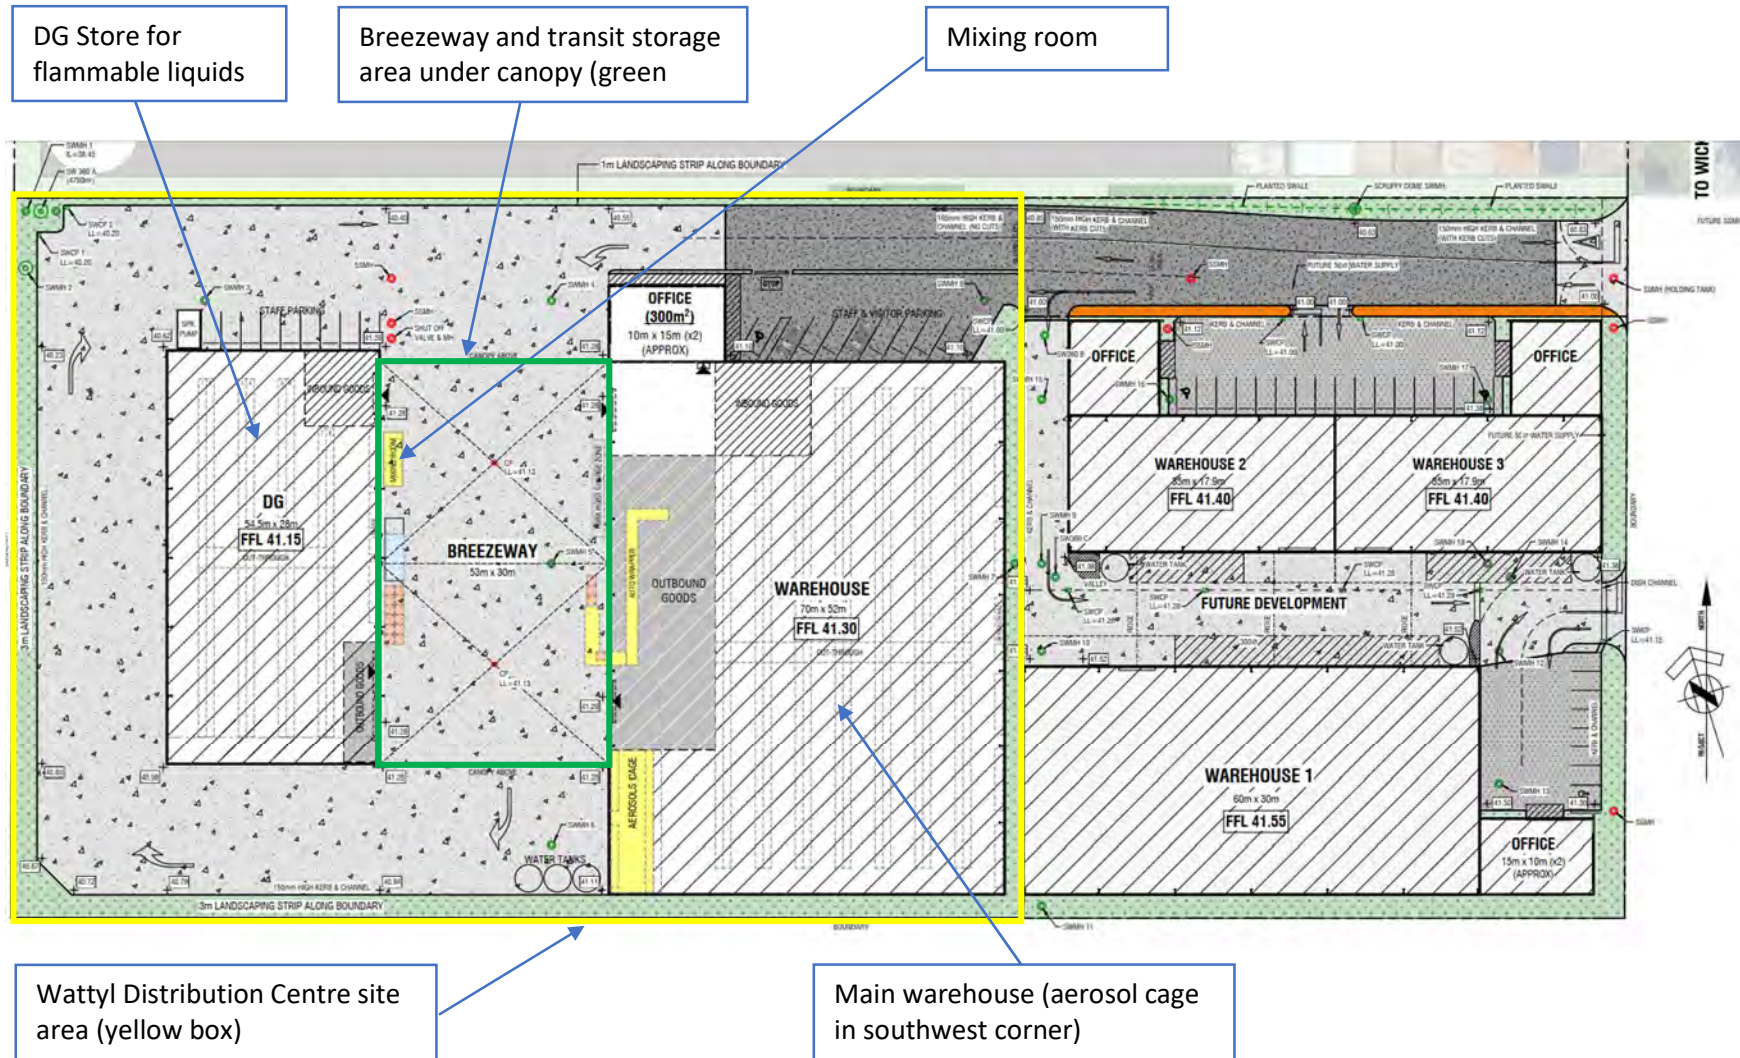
Proposed site plan showing indicative hazardous substances locations (sourced from Proposed Site & Finished Levels Plan by Stiffe Hooker Ltd)
